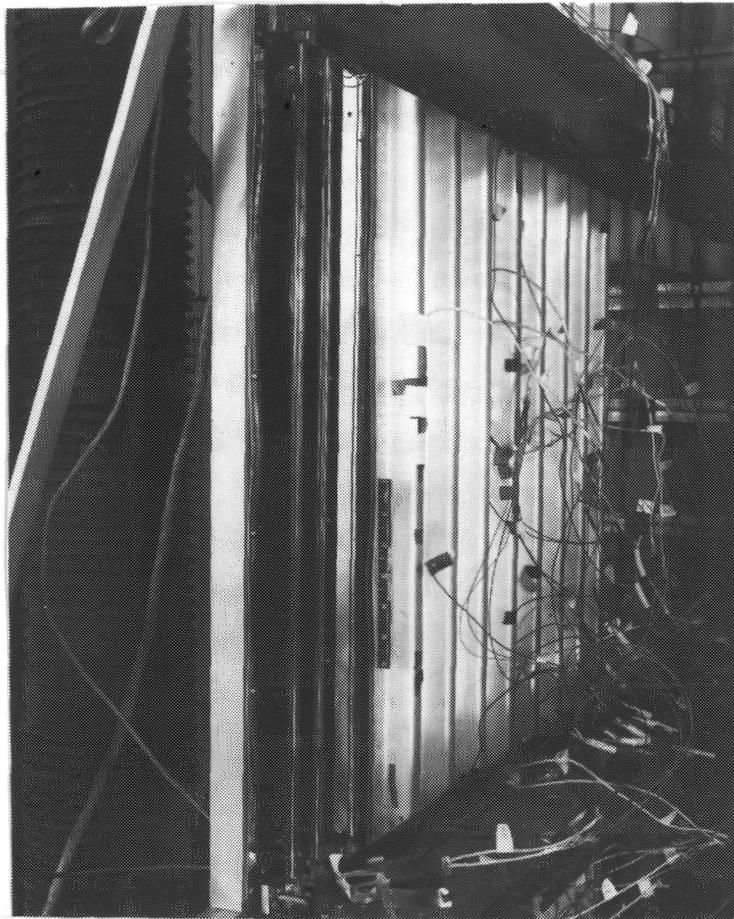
Edge of Compression Panel Buckled due to Overheating.
